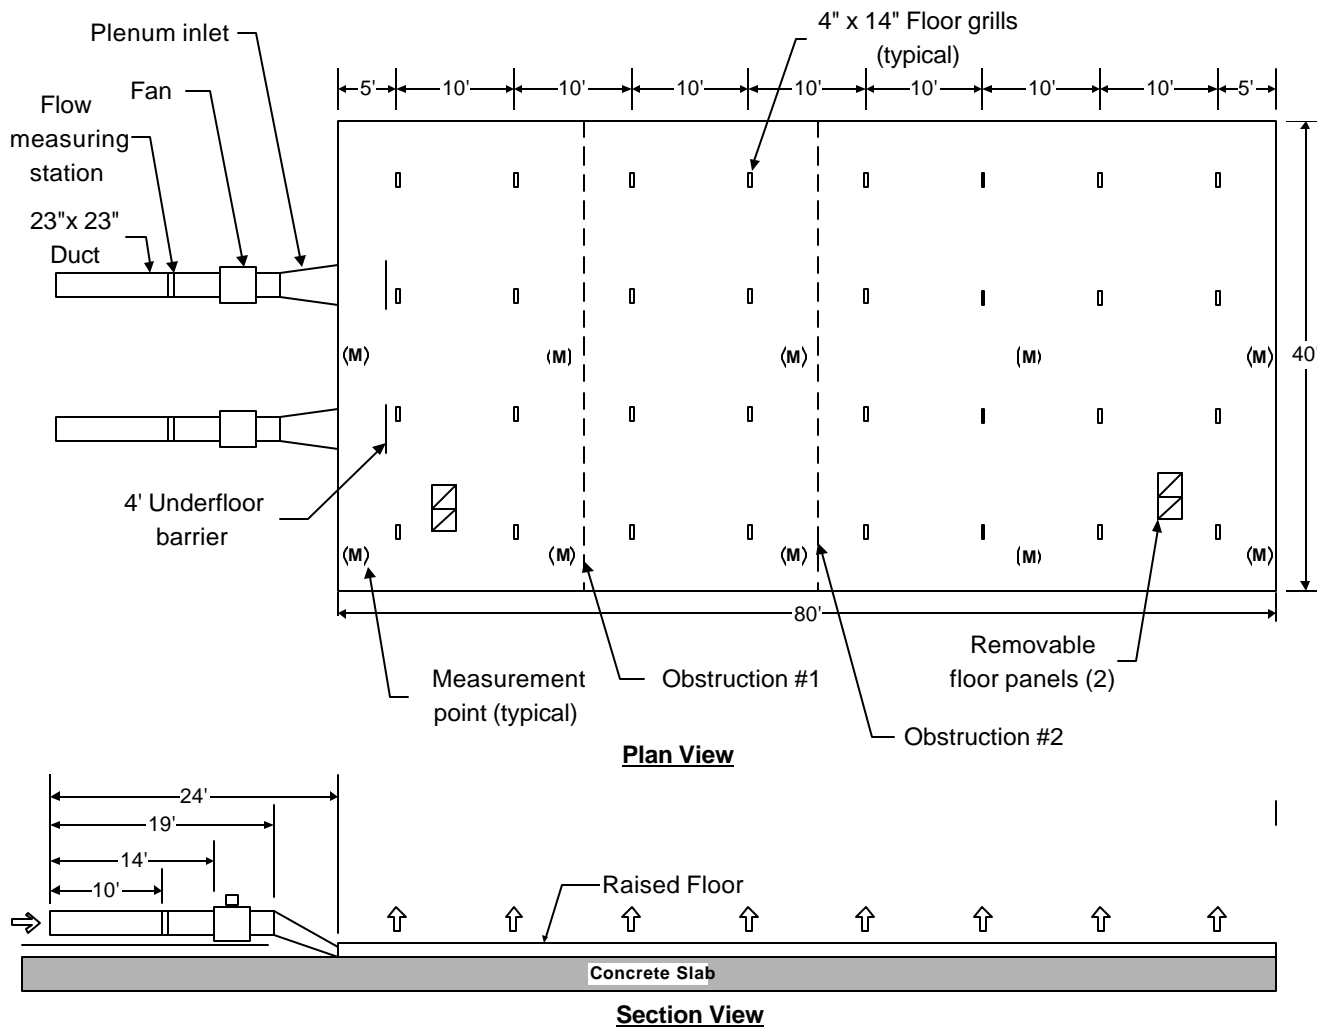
shows plan and section views of the 40-ft (12-m) by 80-ft (24-m) underfloor air supply plenum test facility, that was set up in a large unoccupied space of an open plan office building in southern California. The test area had an existing 8-inch (205-mm) raised access floor (slab to finish floor height) producing approximately 7 inches (180 mm) of clear space between the concrete slab and the underside of the floor panels. The perimeter edges of the test area were sealed with a combination of plastic sheeting and duct tape. Air was supplied horizontally into the plenum along one 40-ft edge of the plenum by two centrifugal inline fans with one-hp variable speed motors. A variable frequency drive controlled the two fan motors in parallel, allowing a range of air supply volumes into the plenum to be investigated. As shown in Figure 4 and the photo in Figure 5, the fan/inlet duct configuration included a flow measurement station that provided an accurate measure of the flow being supplied into the plenum.
